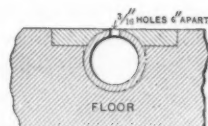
BRASS PIPE 6 FT. BACK FROM CREST
